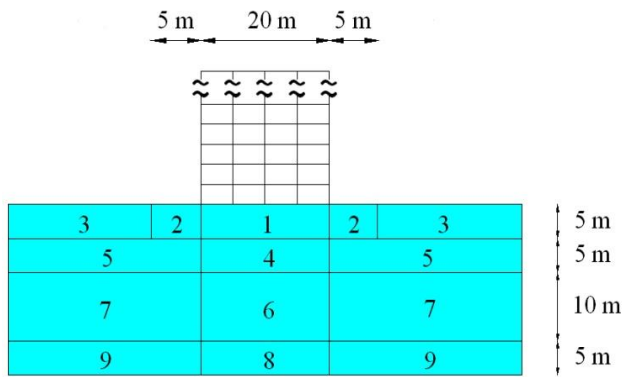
Regionalizing foundation soil in 3D FE models: a single building on site 1
